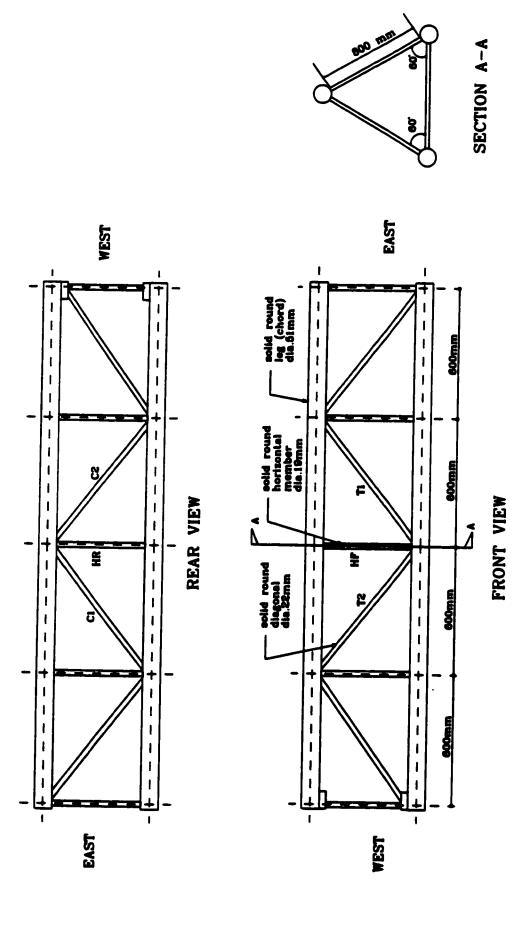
Dimensions of Specimens LR7 and LR11
